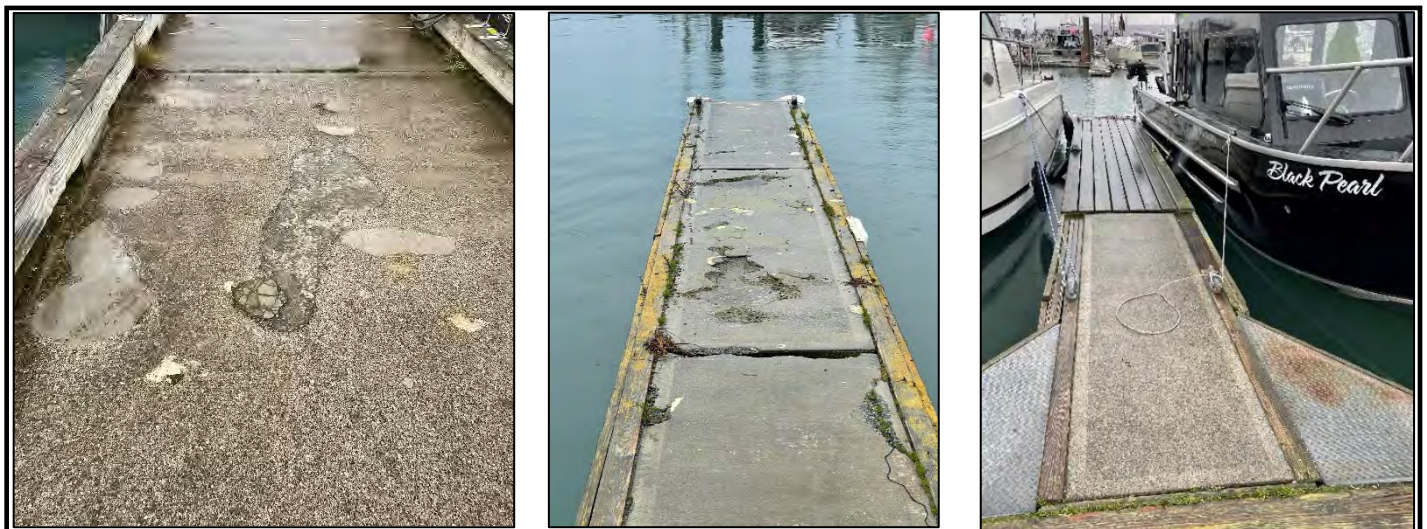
Deteriorated concrete surface and concrete repairs, including covering with timber decking.
